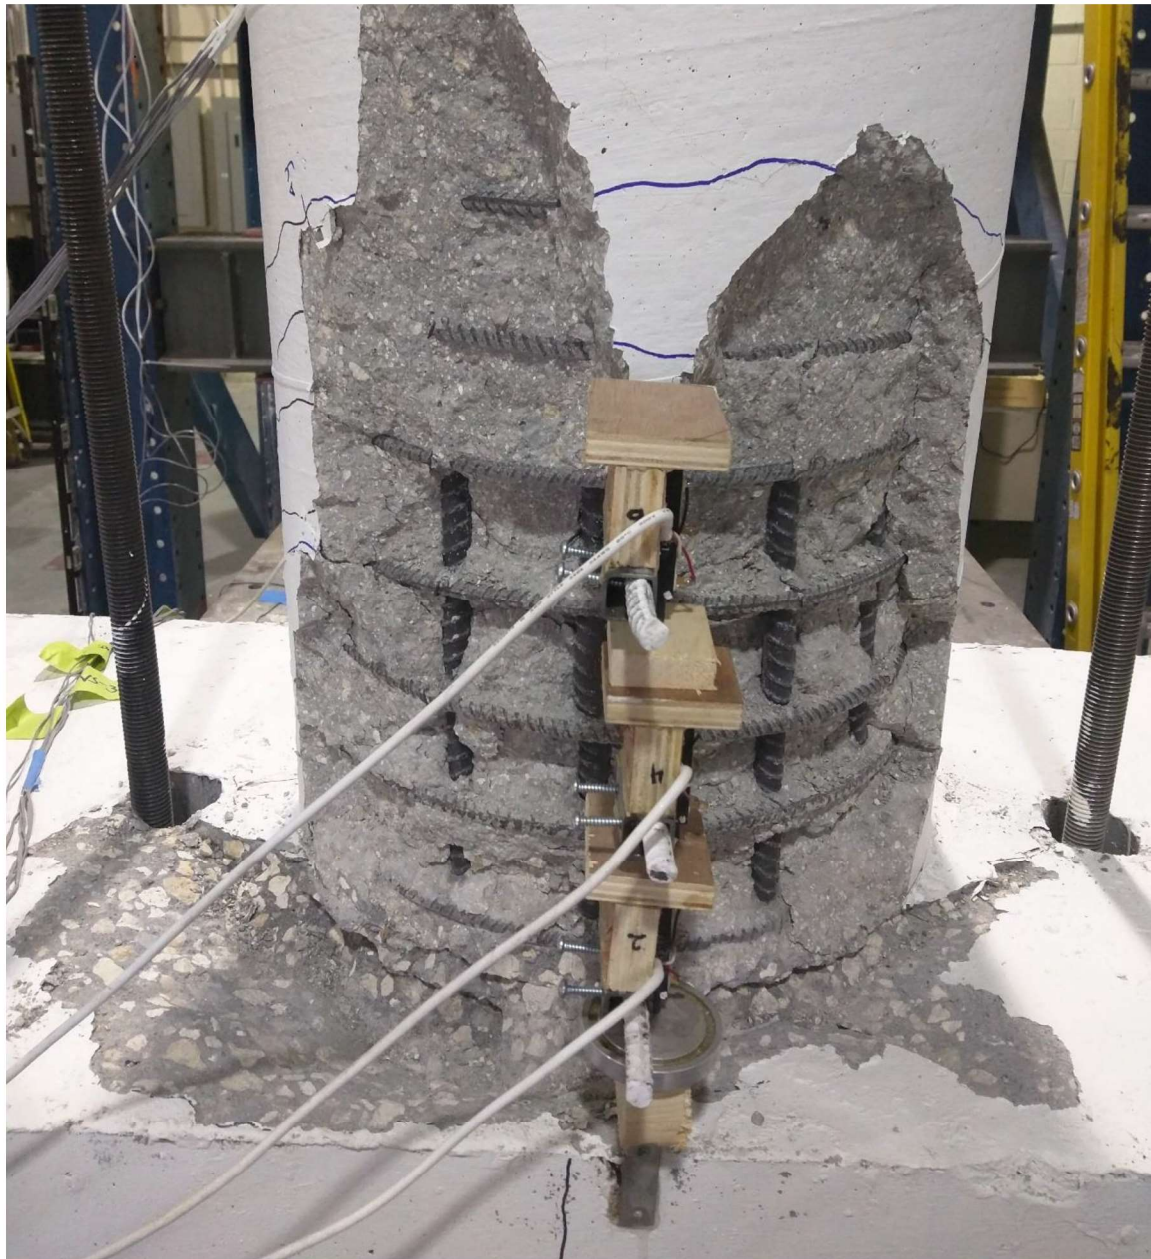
Cap-beam cover spalling at  $5\Delta_y$  (south of the column).
